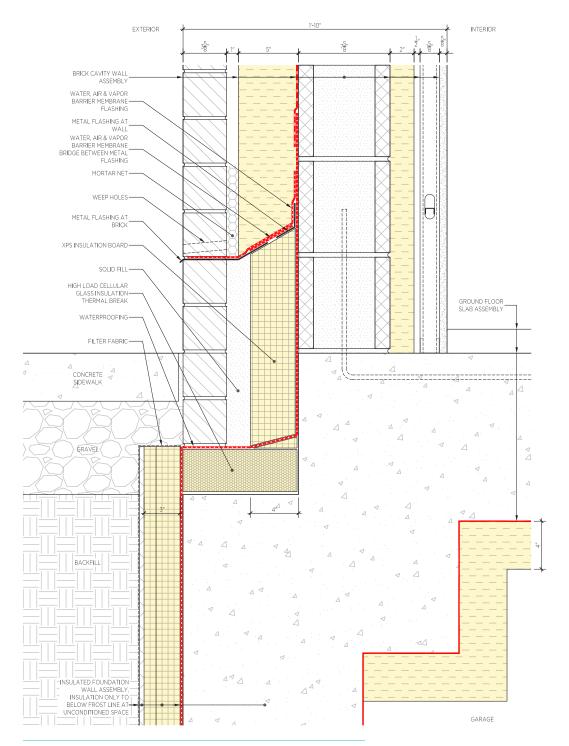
Passivhaus Proposal - Brick cavity at grade with foundation wall and ground floor slab
